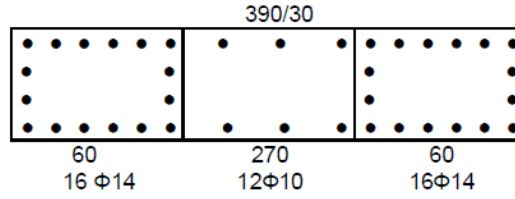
Typical cross-section of an existing shear wall of the four story retrofitted school building
